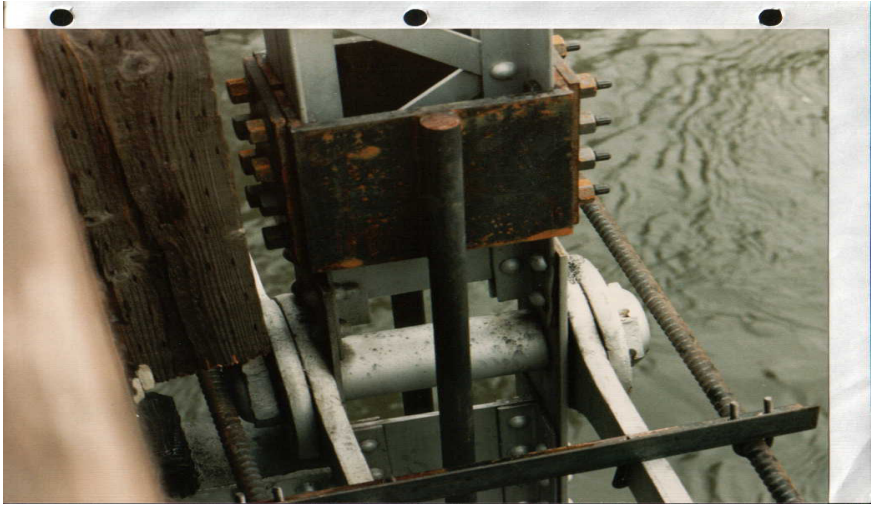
The truss pin is bypassed (direct load transfer from floor beam to vertical to the arch).
